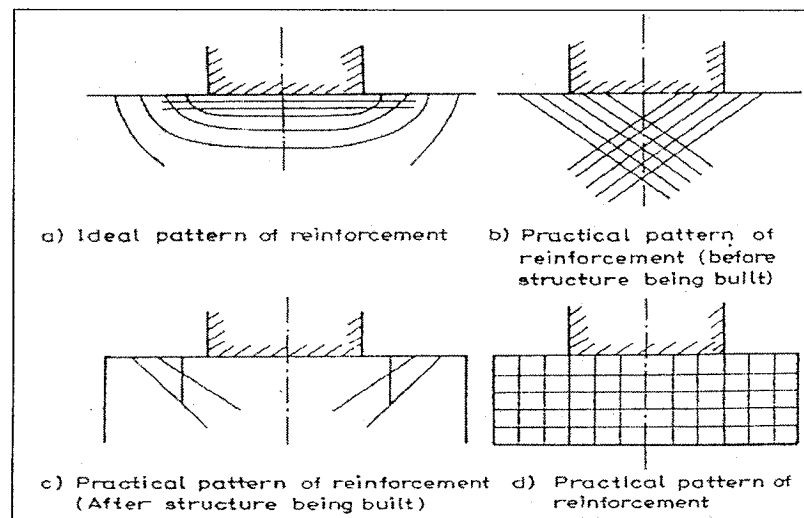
Pattern of reinforcement beneath footing (Basset and Last (1978))
